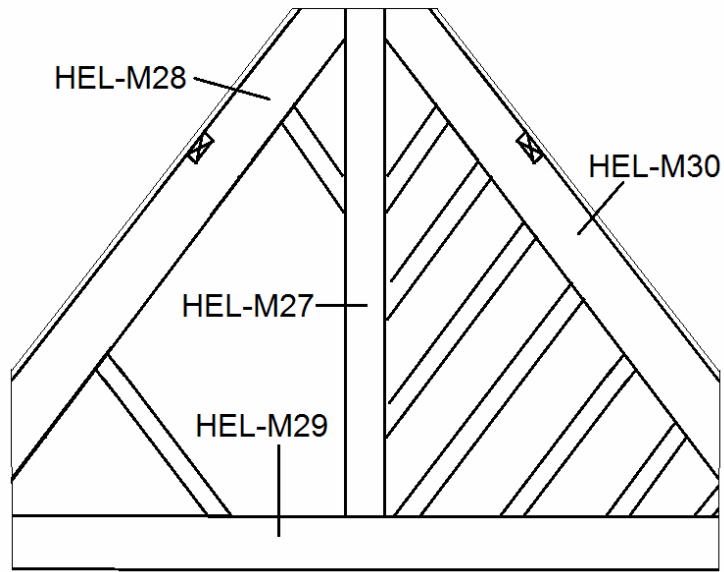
West wing, sketch of truss 1, showing the location of samples HEL-M27–30
